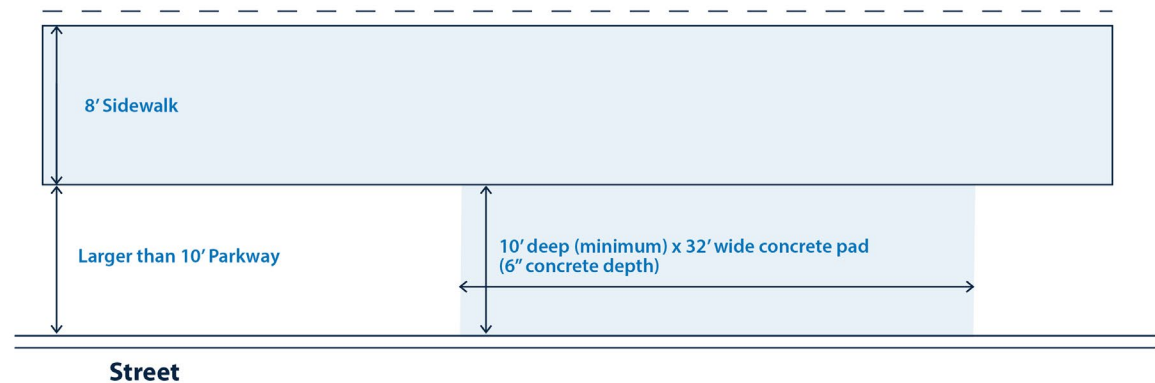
Type III Wide Parkway (Detached Sidewalk)
